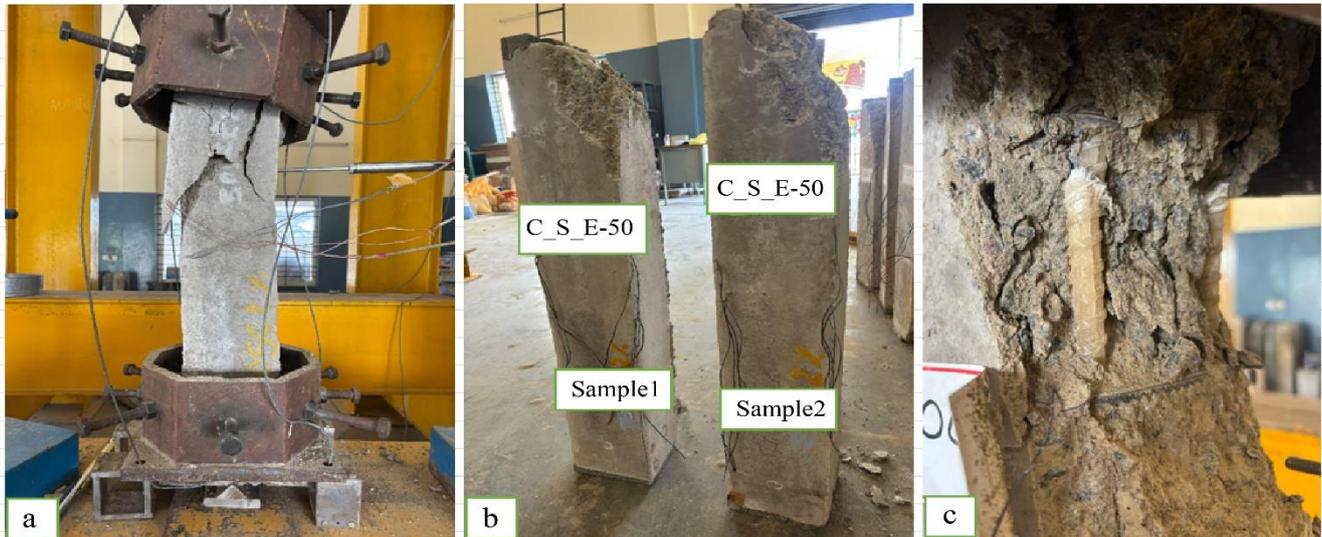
Failure patterns, (a) The concentrically loaded column failed in crushing, (b) Eccentrically loaded columns failed on the sides diagonally, exposing the reinforcement, and (c) GFRP bars got disrupted subsequently, and spalling in concrete was observed when the column was loaded eccentrically.
